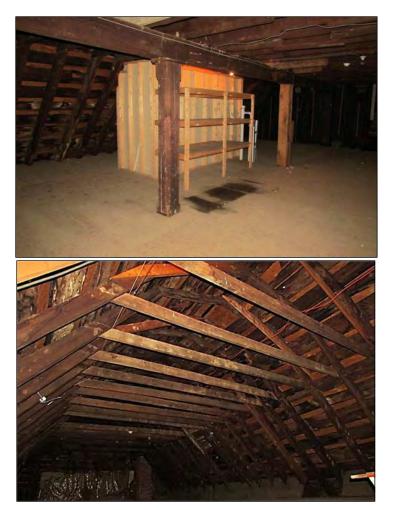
THIRD STORY INTERIOR, FACING SOUTHEAST (TOP); ROOF STRUCTURAL SYSTEM IN ATTIC, FACING SOUTHWEST (BOTTOM)
